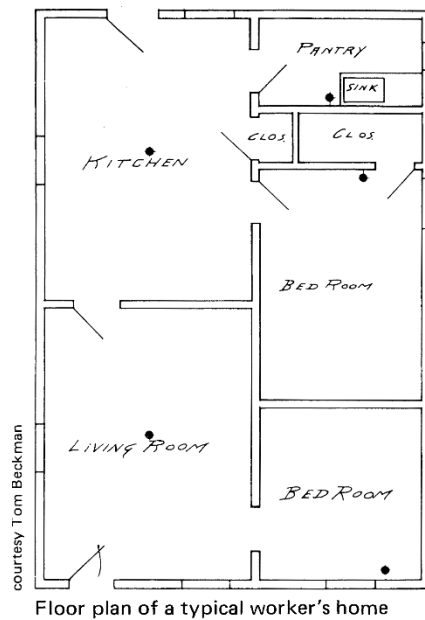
Typical cottage floor plan as shown in Gurda 1979.
